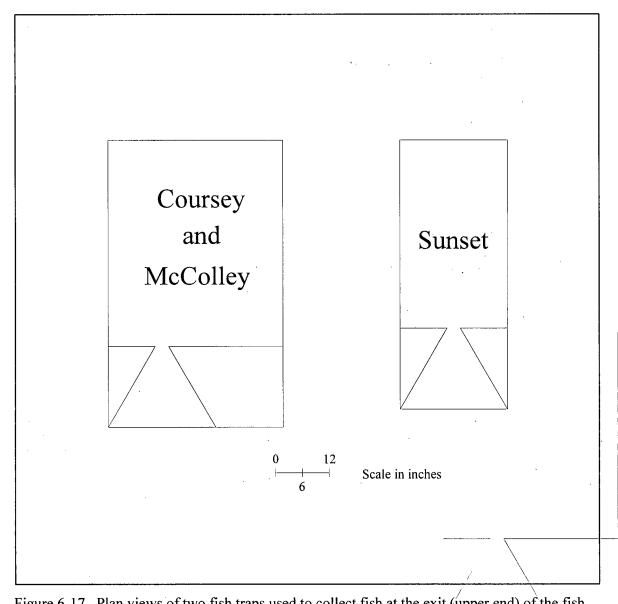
Plan views of two fish traps used to collect fish at the exit (upper end) of the fish ladders.
